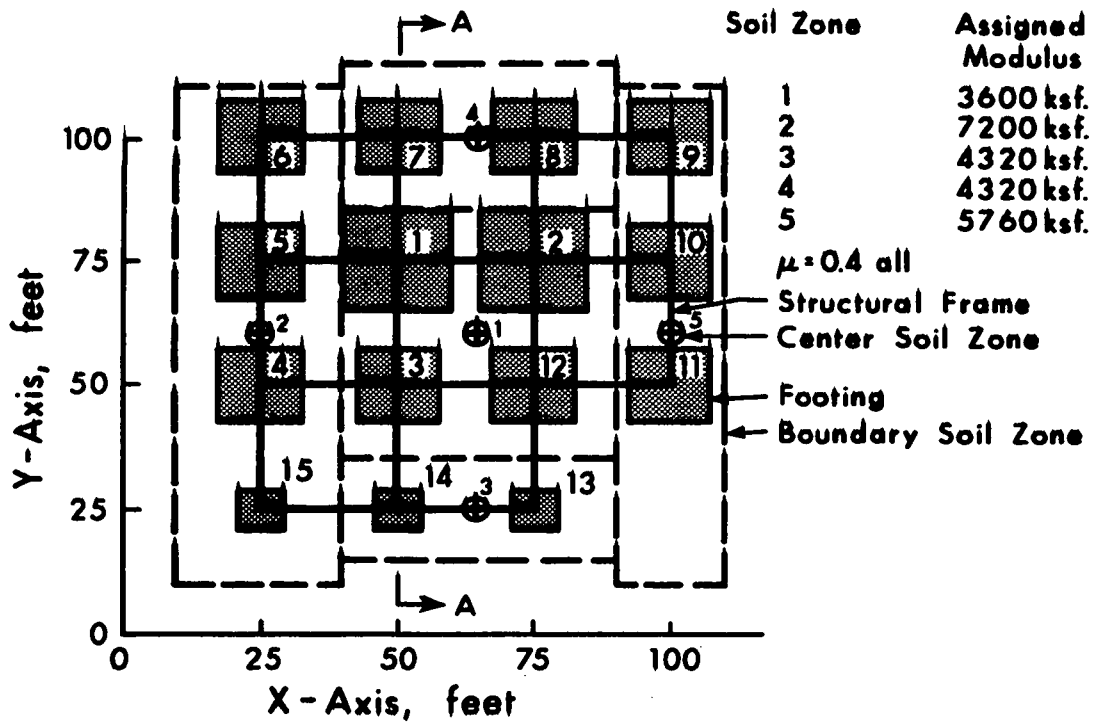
Building Frame and Foundation, Illustrative Example
